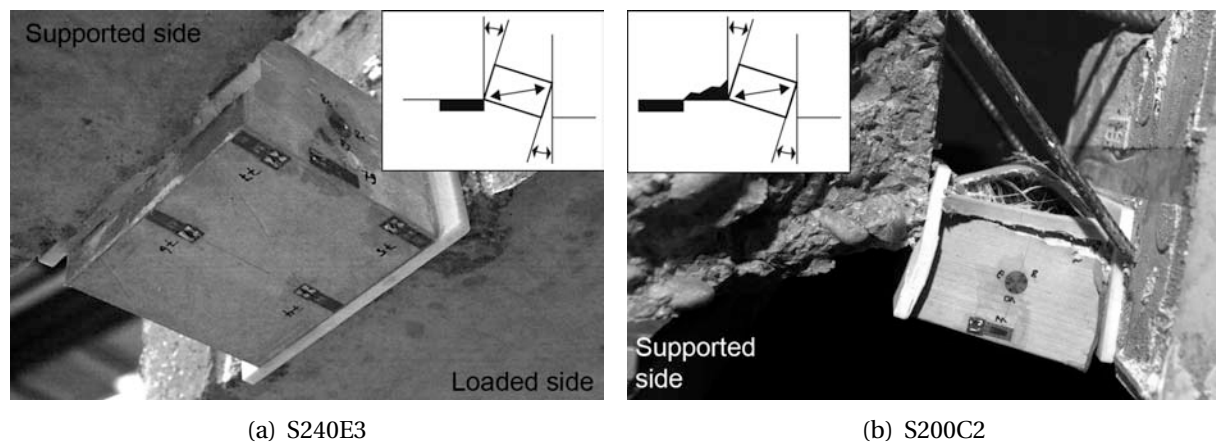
Failure modes in shear mode, view from below. (a) Concrete undamaged, steel bar failure, debonding failure (secondary); (b) Concrete failure at supported side, no damage at loaded side
